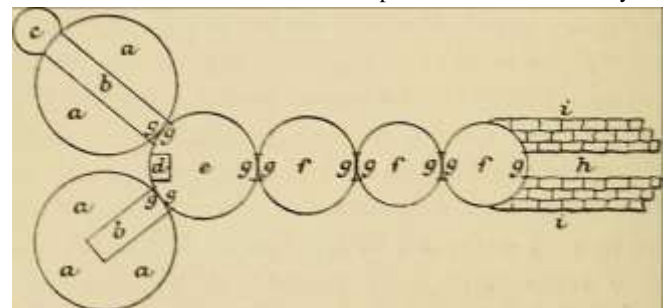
Family rural apartments. Floor plan of two Inuit snow houses (1904)
